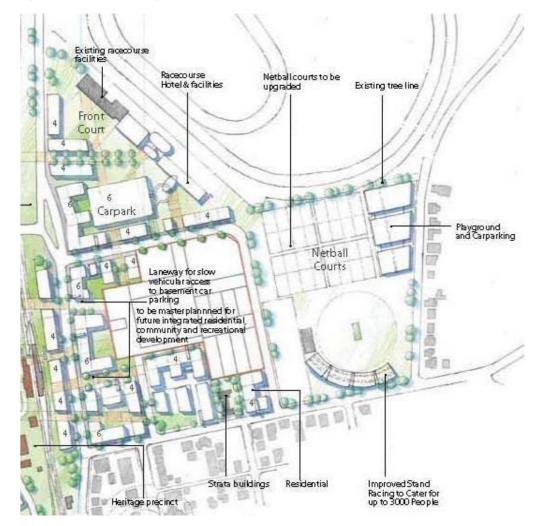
Site plan of the preferred masterplan option for the Baker Park Area
